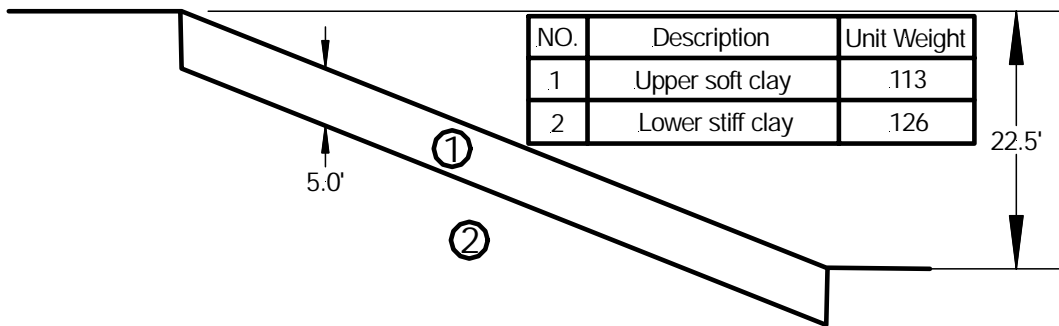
Cross-section assumed for stability condition B at the I70-Emma test site.
